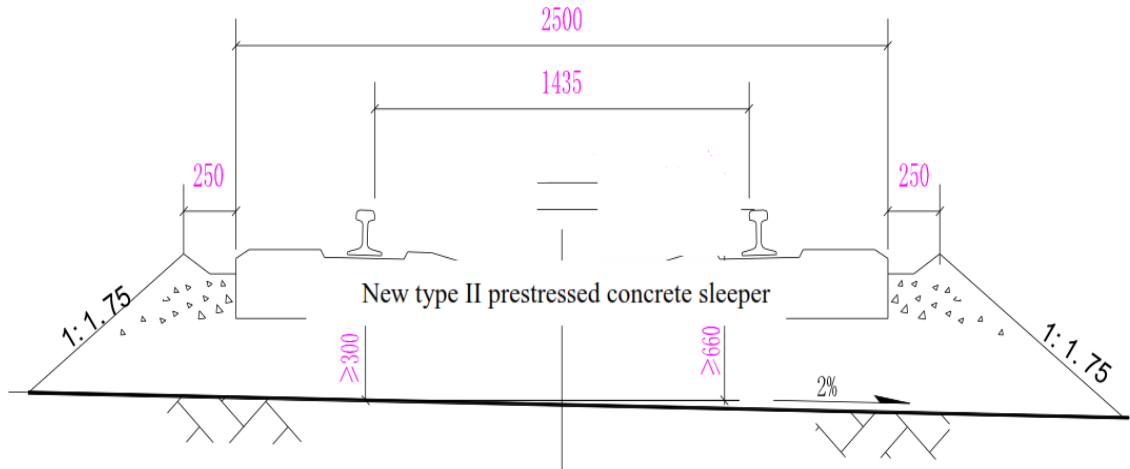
Concrete Sleeper Type Ballasted Track Bed for Ground line
